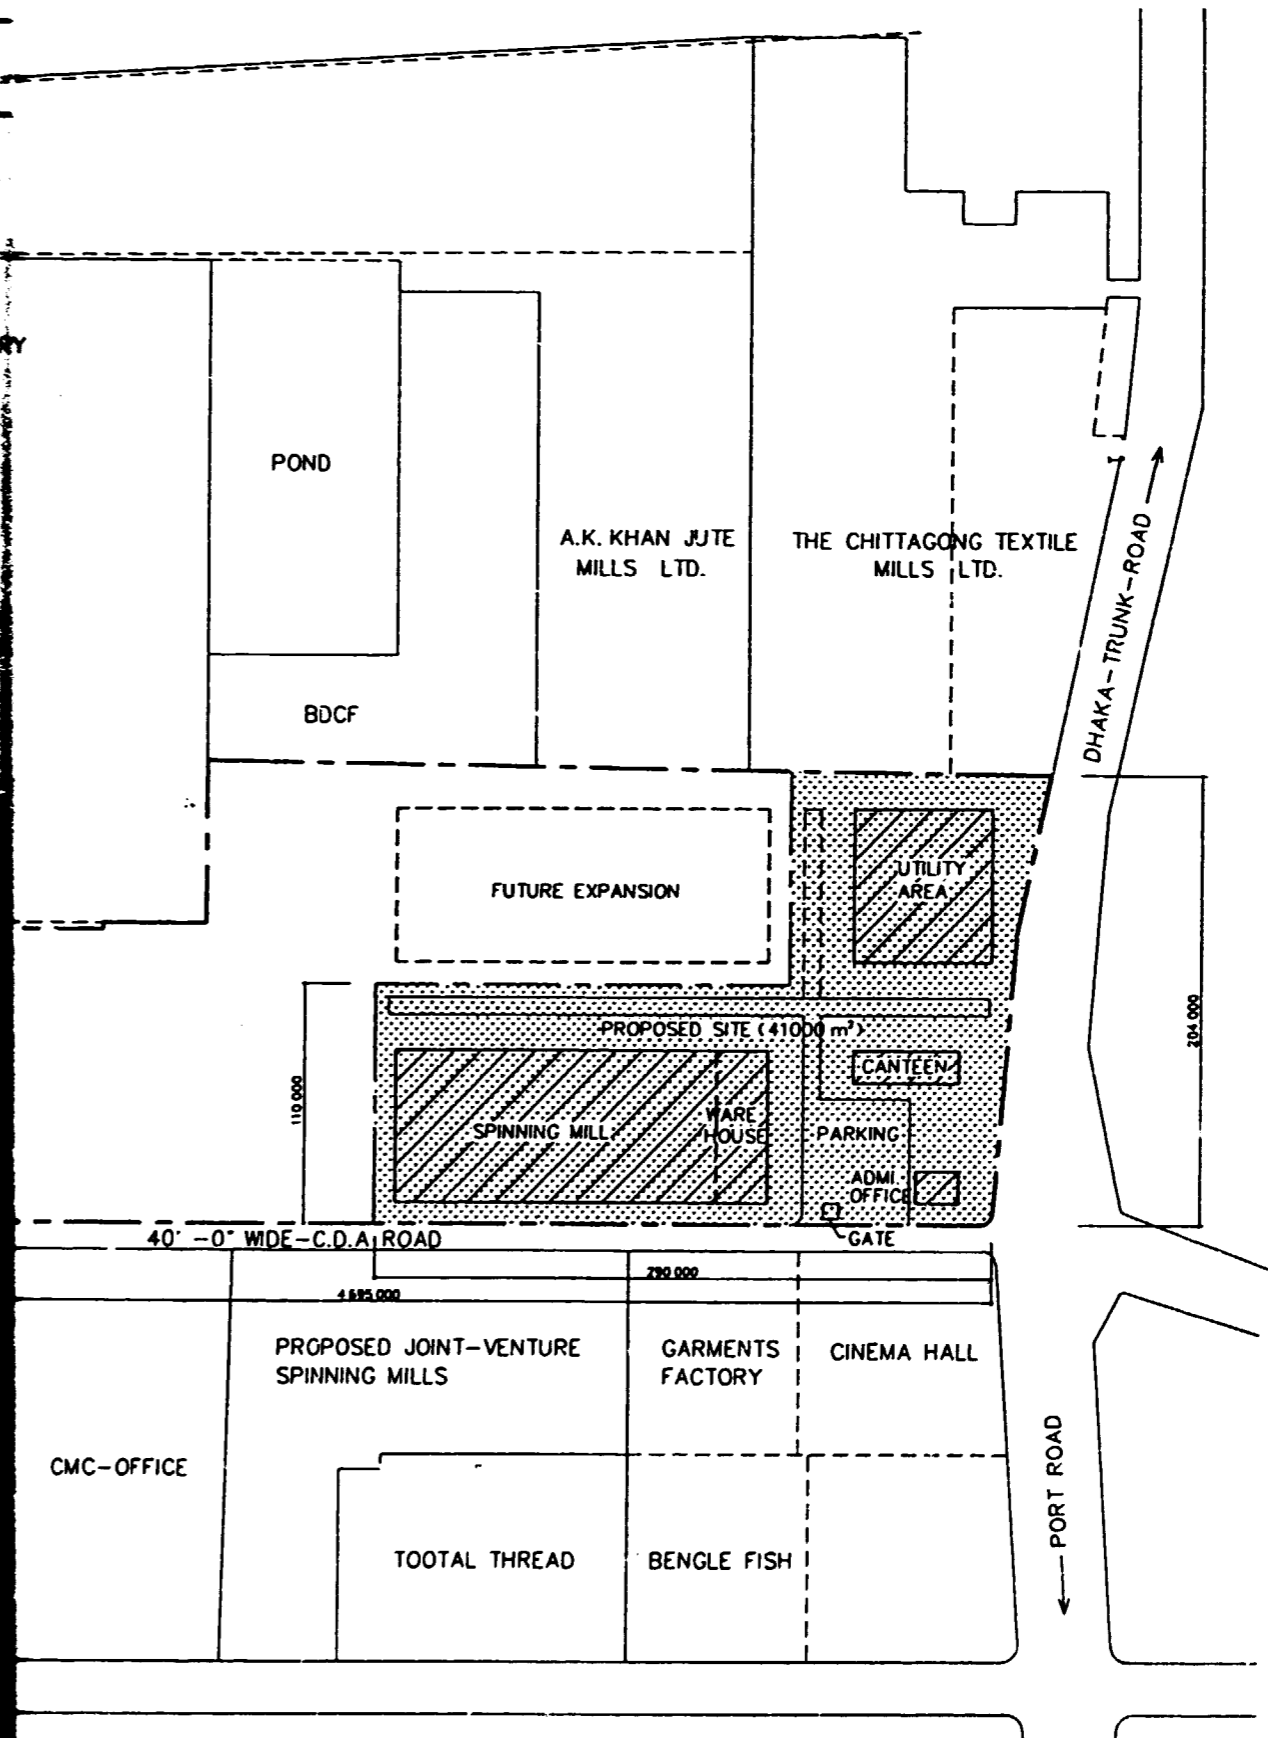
BLOCK PLAN (CASE 3) AT A.K. KHAN SITE FOR PROPOSED SPINNING MILL IN
